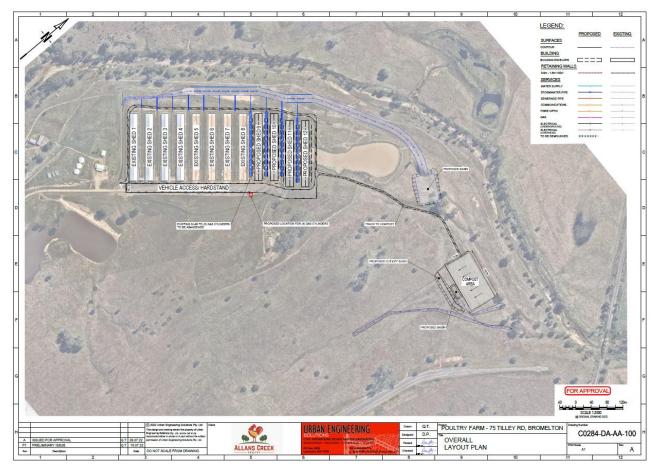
Proposed Site Plan (Urban Engineering, 2023)
